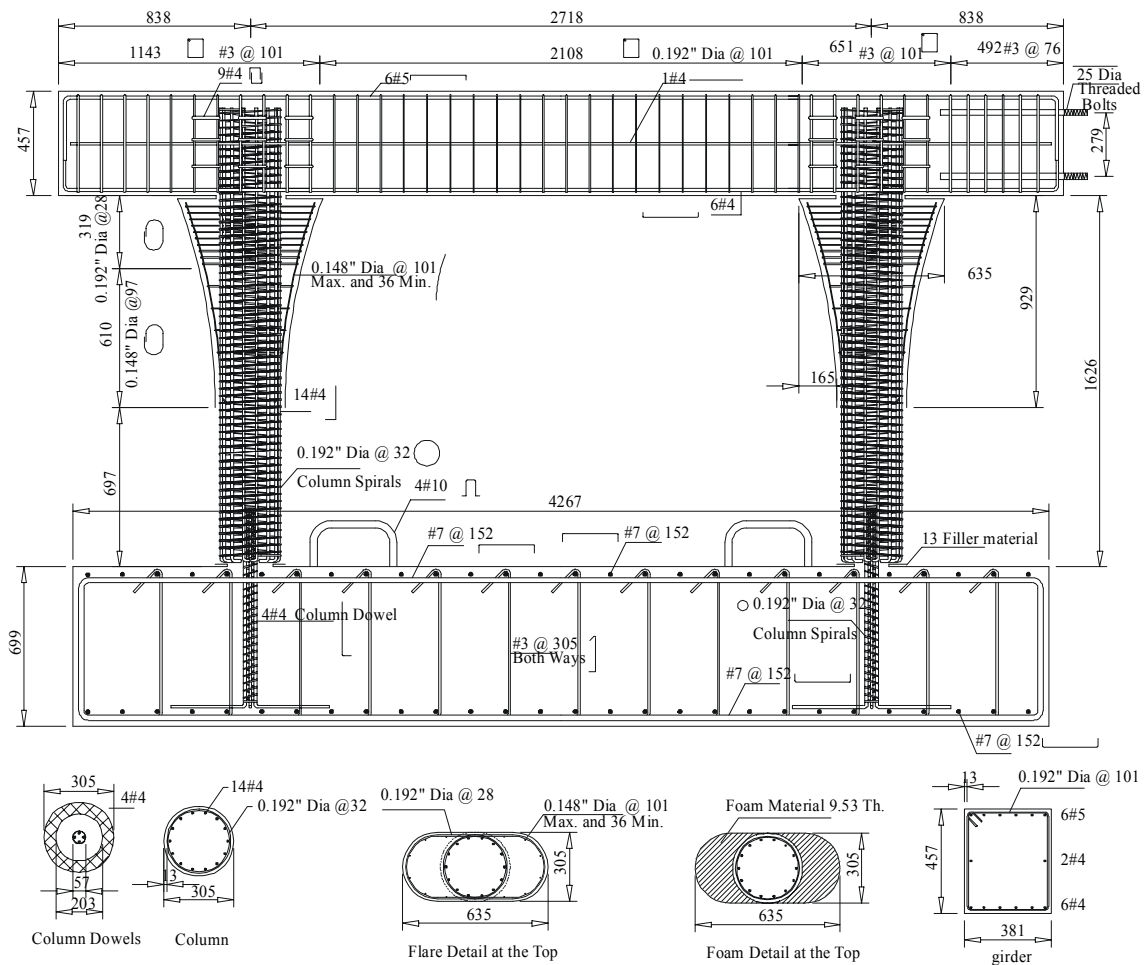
Concrete Layout for SFCD1 and SFCD2.
